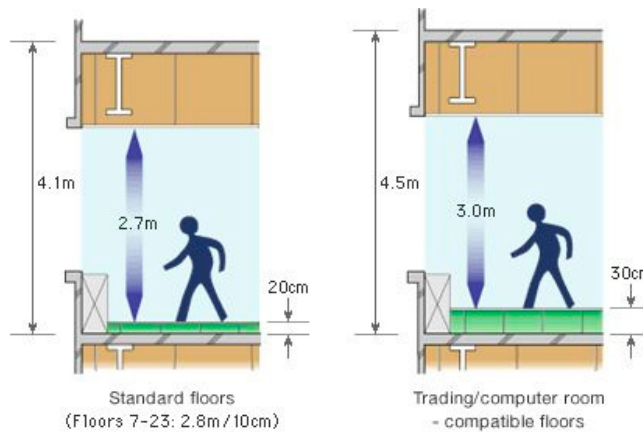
A local commercial building code in Japan. [Note: Specifications - Ceiling Height. Reprinted from Office Leasing in Japan | Mori Building Co., Ltd. - MORI Building, n.d., Retrieved December 15, 2023, from https://www.mori.co.jp/en/office/japan/spec/ceil_roppongihillsmt.html. Copyright Mori Building Co., Ltd. 2024 All Rights Reserved. Reprinted with permission.]
